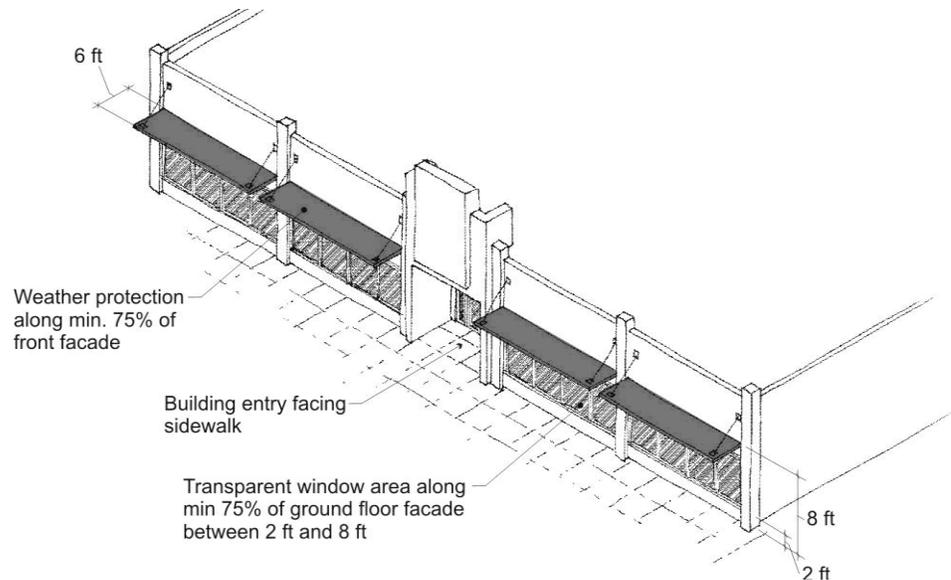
B.30.100b. Pedestrian-oriented façade requirements.
